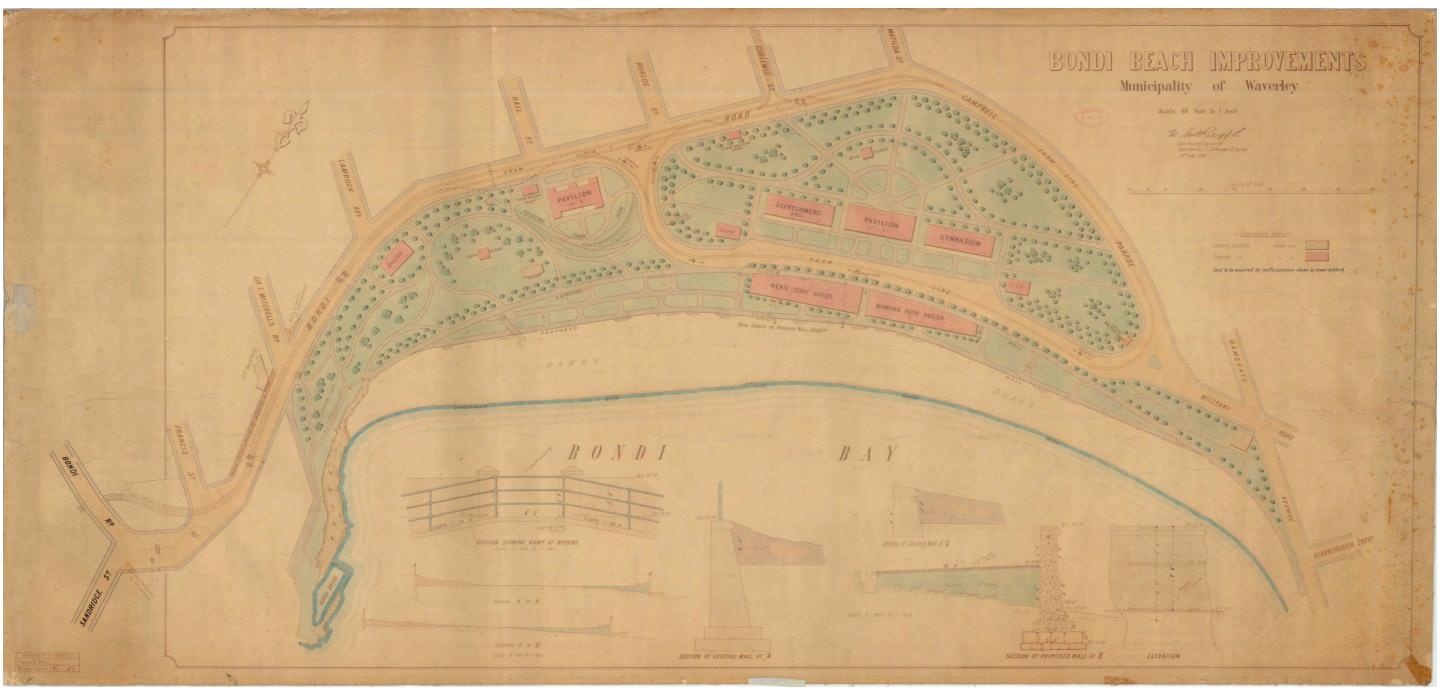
Walter Scott Griffiths plan of Bondi Beach Improvements dated September 1920. As well as the plan at the bottom of the drawing are sections showing the proposed level in front of the sea wall, details of ramps and of sea wall construction. The plan shows a sea wall on the seaward side of the existing sea wall. The seaward area was to be the site for male and female surf sheds at a lower level. On the shore side was a pavilion, on the site of the current building, with a refreshment hall and a gymnasium on each side and the two surf clubs at each end of the group. It provided two alternate sites for the pavilion, the other being higher on the existing tram loop. The scheme also included a tramline running along Campbell Parade, then the marine drive and rejoining Campbell Parade north of the existing tram loop forming a new tram and one way vehicle loop. Smaller buildings were tram waiting rooms and bandstands. The proposed path network included a wide path at the back of the pavilion and a large semi circular path bisected by paths radiating from the centre of the rear of the pavilion. At the south end of the park informal curvilinear paths remained. The scheme shows extensive plantings with double rows of trees along the external roads and single rows on each side of paths within the park, except the radial paths. There was a single row of trees along the sea wall, double at the south. There are groups of presumably smaller plants at the centre of the large park "rooms". Source: WLS Engineers Plan 0004436
